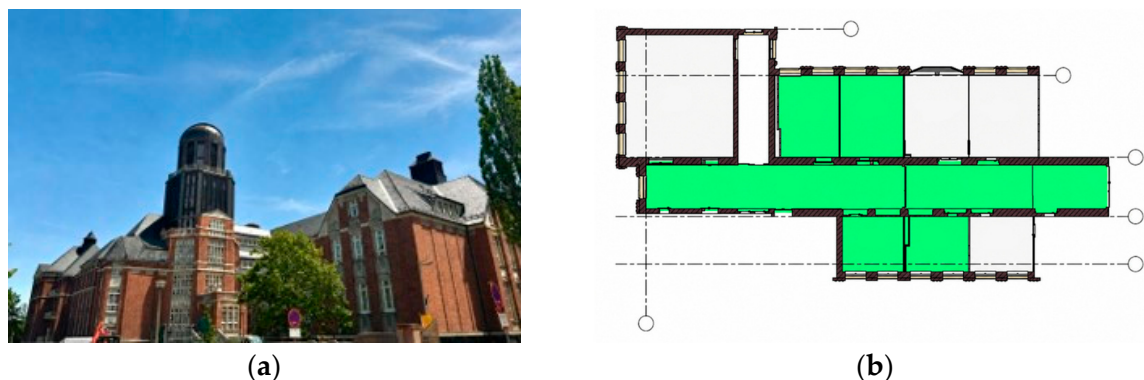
(a) Exterior view of the BeyerBau building, TU Dresden; (b) floor plan of the selected west wing area labelled in green.
